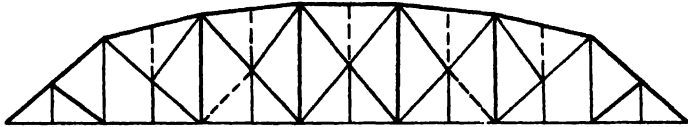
Petit Truss with Sub-ties and Polygonal Top Chord (Pennsylvania Truss).
